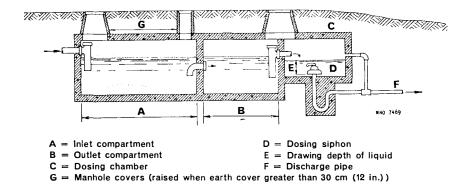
TYPICAL HOUSEHOLD SEPTIC TANK
